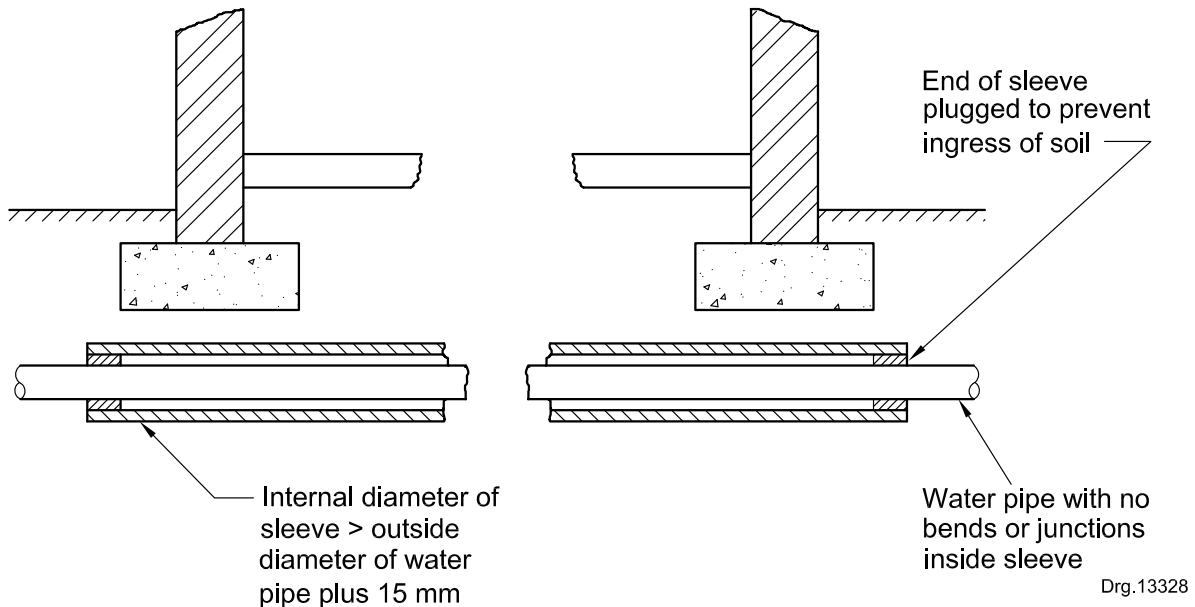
Sleeve for installing a water pipe under a building or under a surface slab
